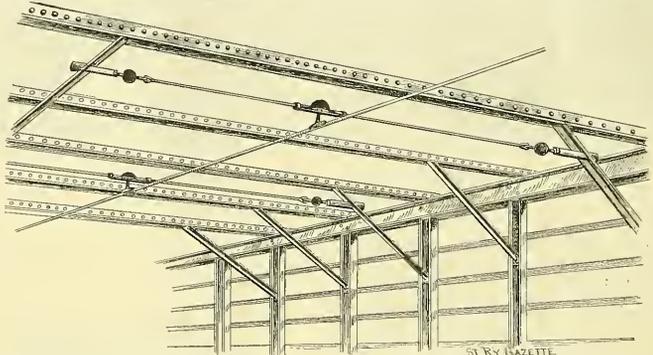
OVERHEAD CONSTRUCTION ON THE SUSPENDED STRUCTURE OF THE BRIDGE.
